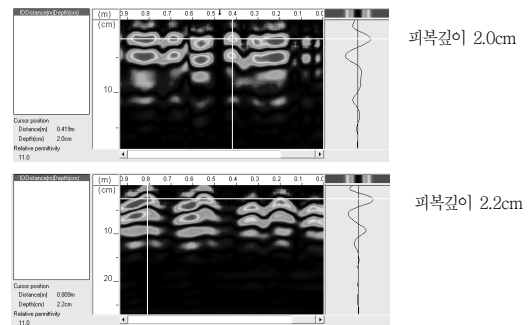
Cover thickness of Exit of Tunnel B (Left Wall(Up) Right Wall(Down))
